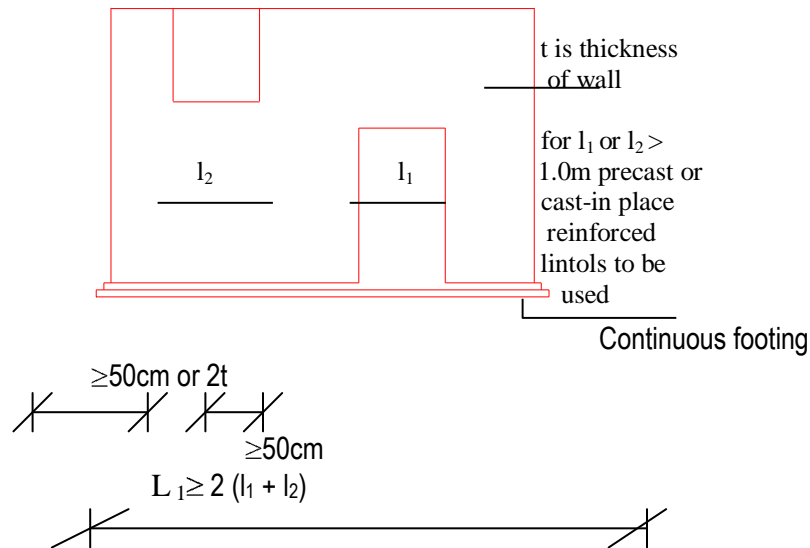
MASONRY IMPROVED STURDINESS MASONRY FOR ASEISMIC DESIGN
